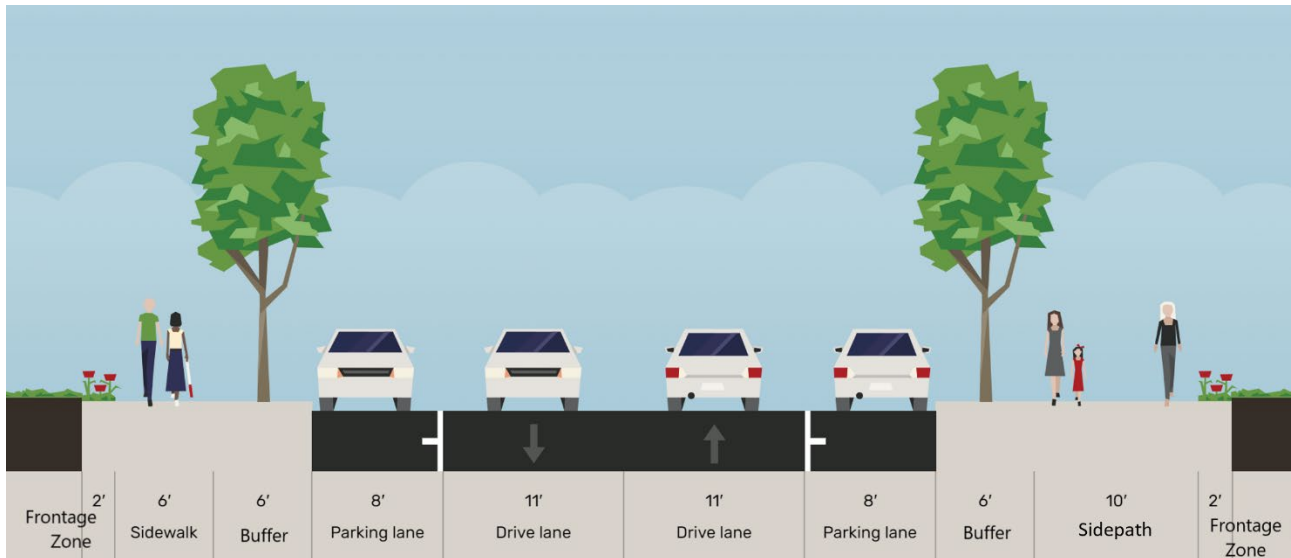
Alternative 3 Cross Section Recommended by Planning Board
